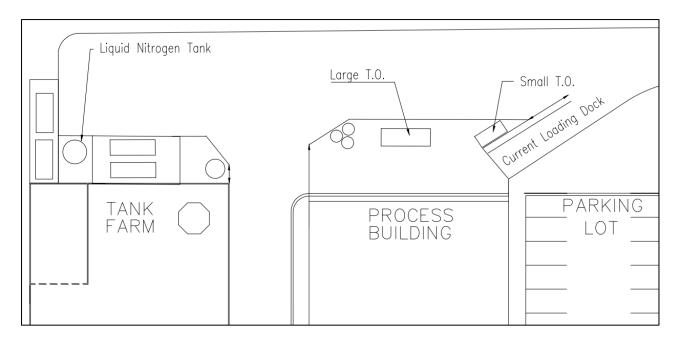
Current Site Plan of Cooling System at Ever Cat Fuels
